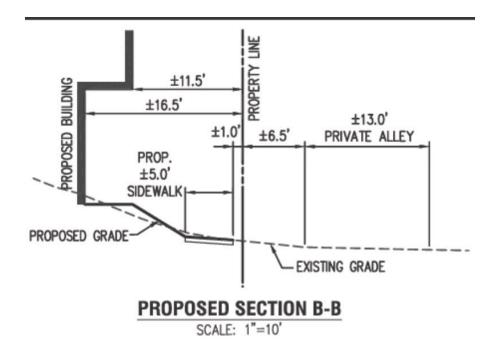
Proposed 31st Street South Cross Section (Facing West)
